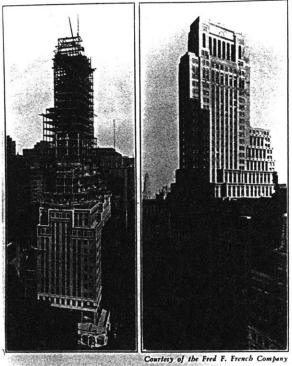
ERECTING THE FRED F. FRENCH BUILDING ON FIFTH AVENUE, NEW YORK CITY
